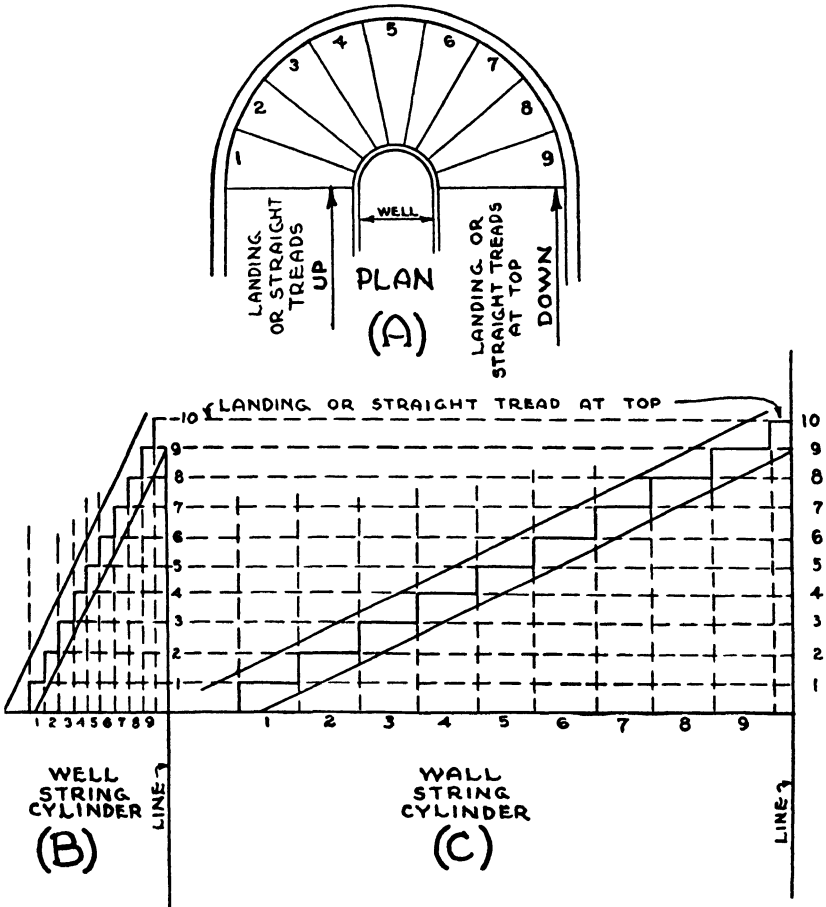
At (A), Plan of Stair with 9 Winders on a Cylindrical Well Hole; (B) Developed Surface of Well-String Cylinder; (C) Developed Surface of Wall-String Cylinder
